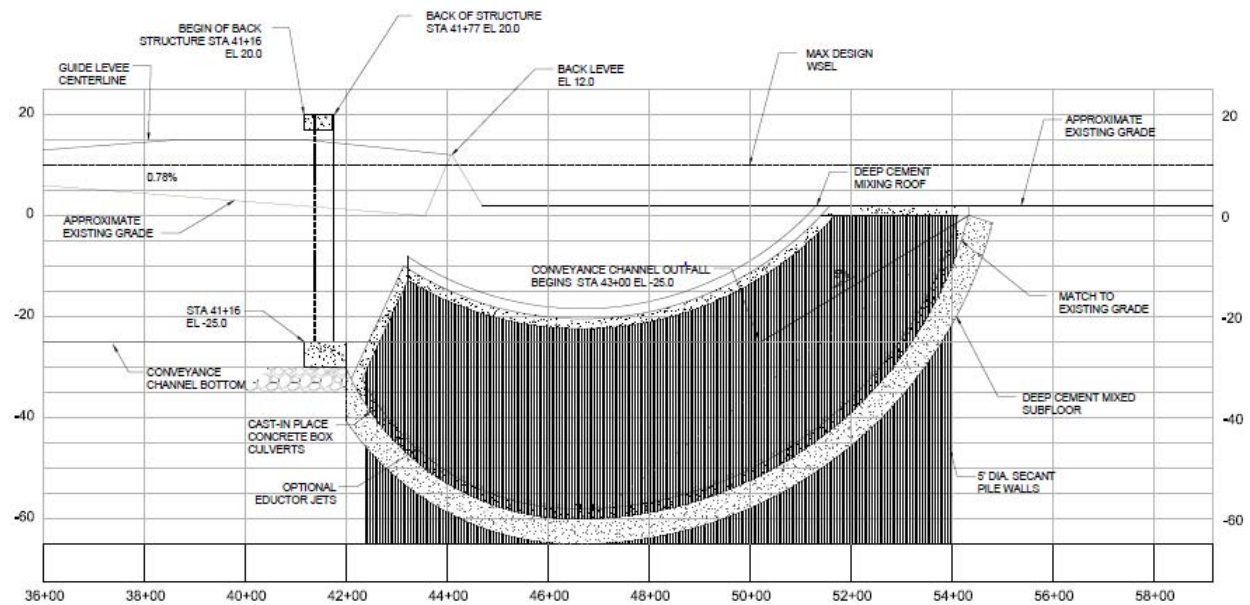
Alt. C – Profile View of the Back Structure, Submerged Box Culverts & Transition to the Breton Sound Basin
